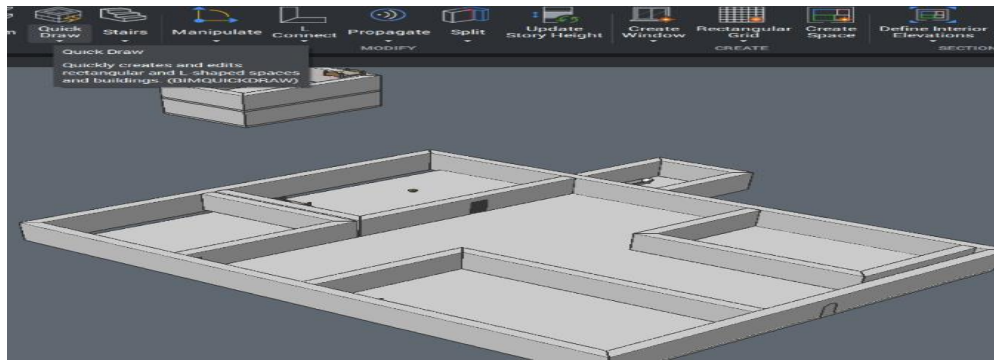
Building Layout Using the QuickDraw Tool in BricsCAD BIM
